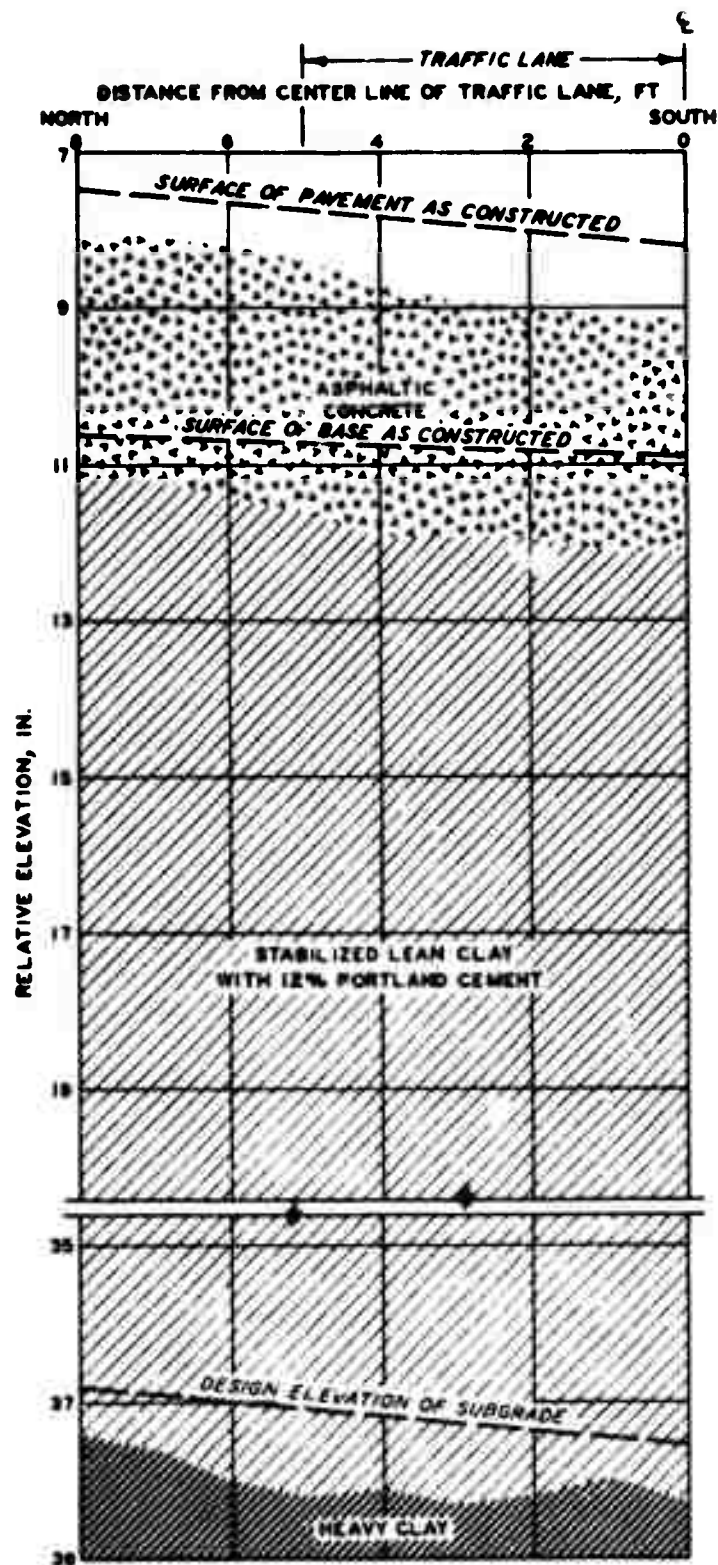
Test pit profile of item 2, lane 1, flexible pavement test section. Station 0+65 after 3660 coverages of 200-kip twin-tandem assembly
